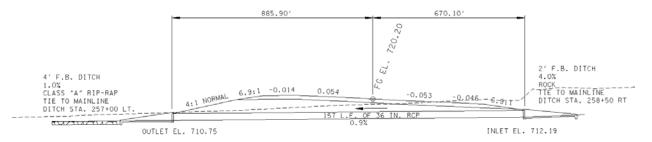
A-27A Example of Culvert Section Sheet for Pipe Culvert
